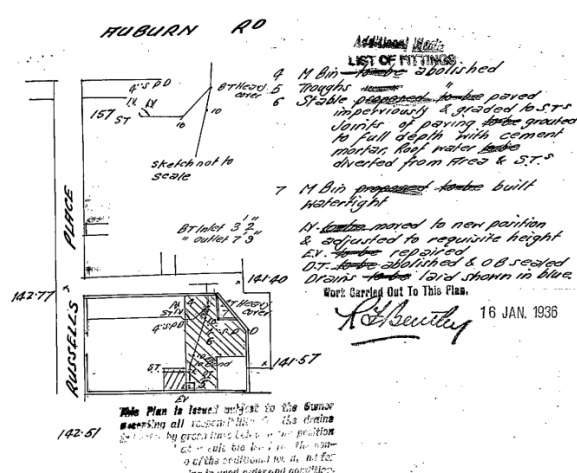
Service Plan shows works carried out to the rear of the stables in 1936. (Source: Property Service Plan No. 74901)
